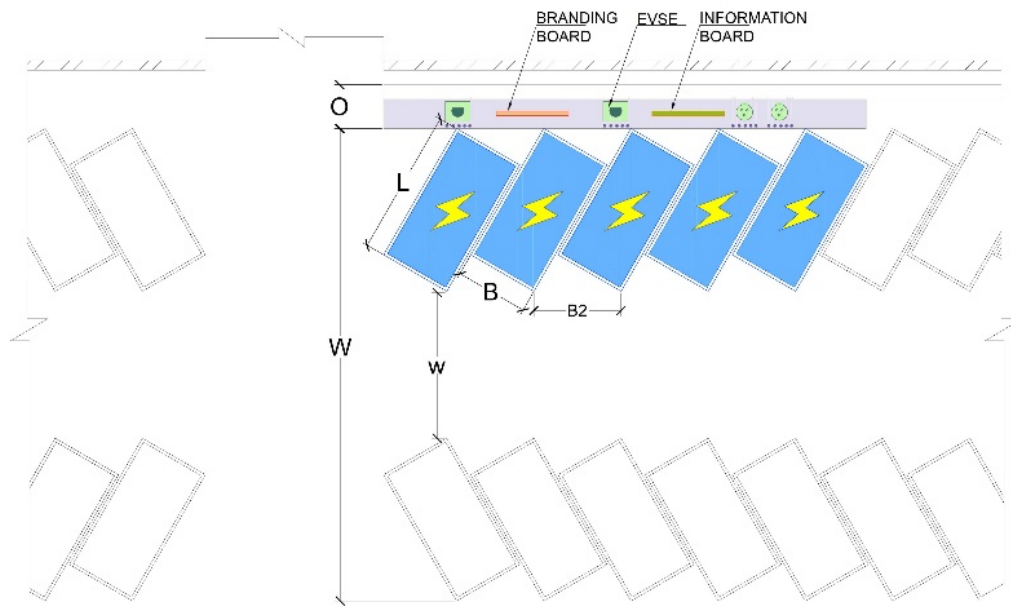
Diagonal off-street charging layout (60-degree angle)
